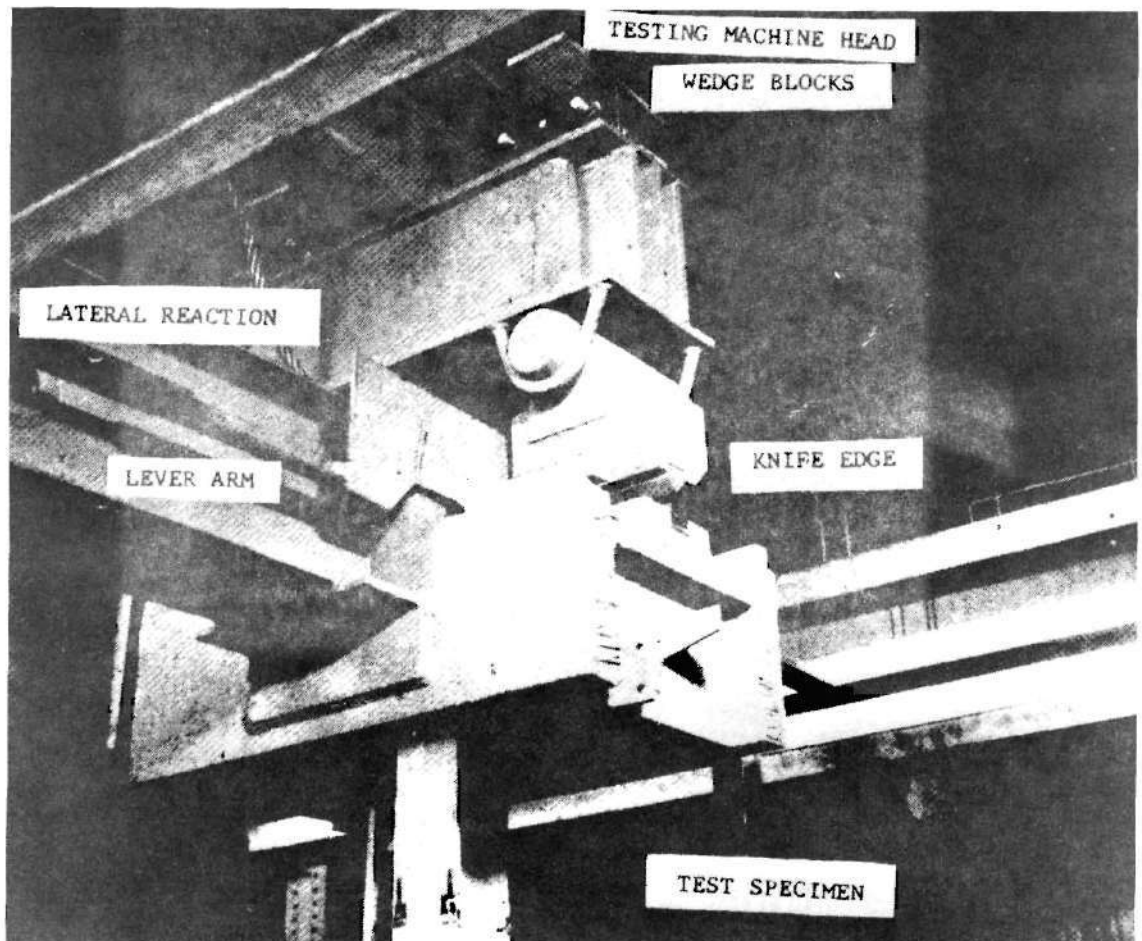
Upper End Fixture of Apparatus Shown in Figure 21 (Adams and Galambos).
